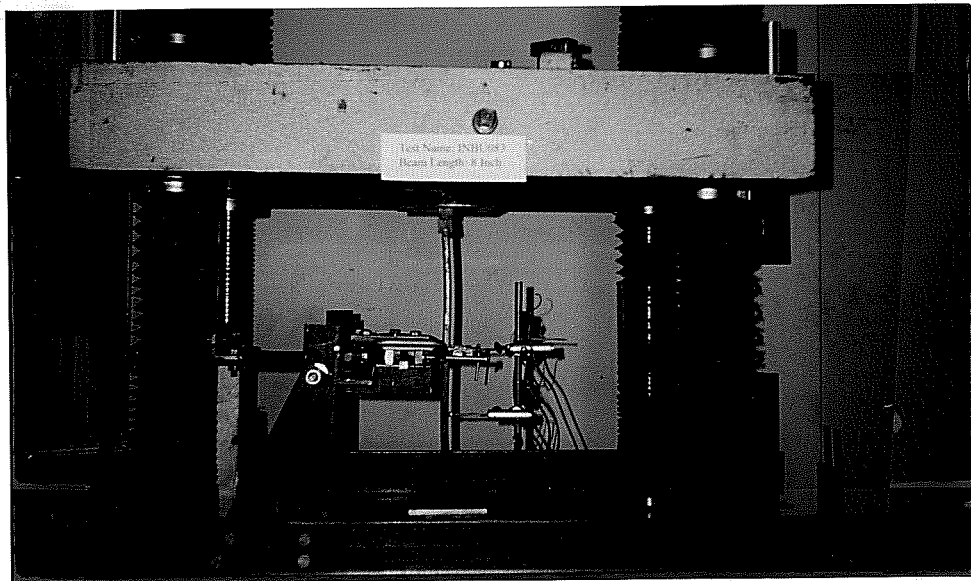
Full Braced Column with Anti-Symmetric Buckling
